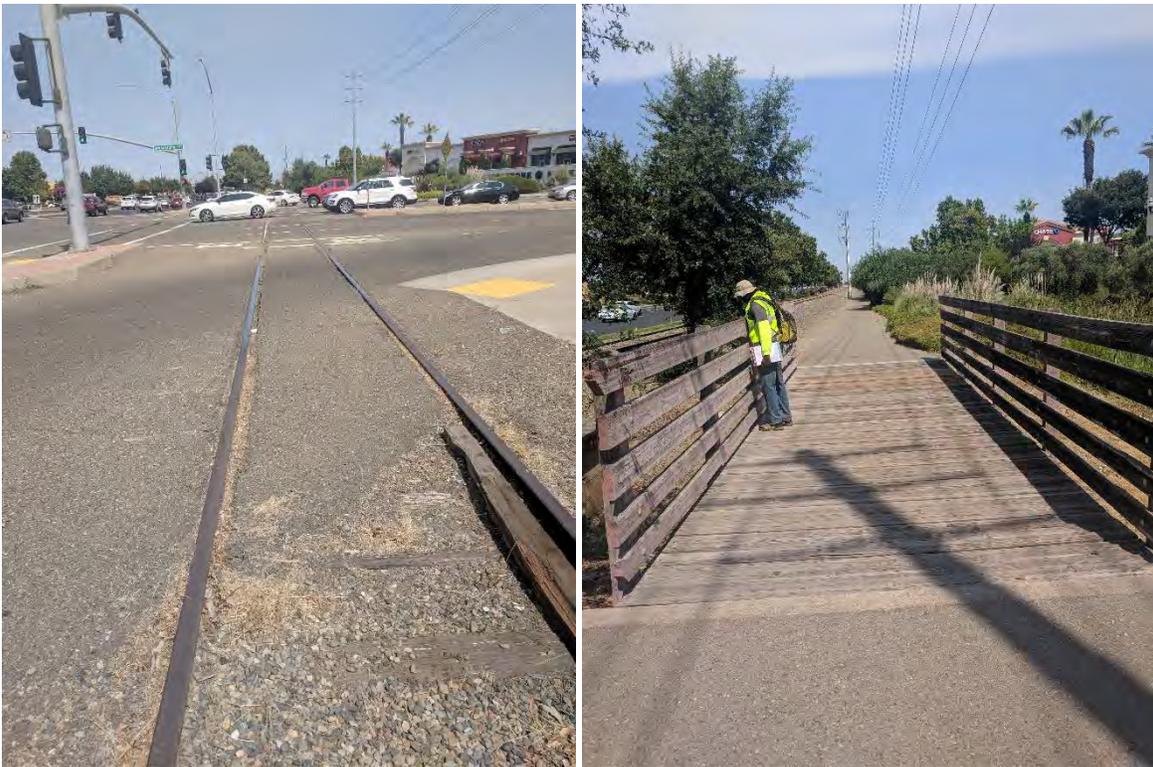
Railroad crossing over Broadstone Pkwy, facing northwest (left) and bridge crossing north of E Bidwell St and Broadstone Pkwy intersection, facing northwest (right)
